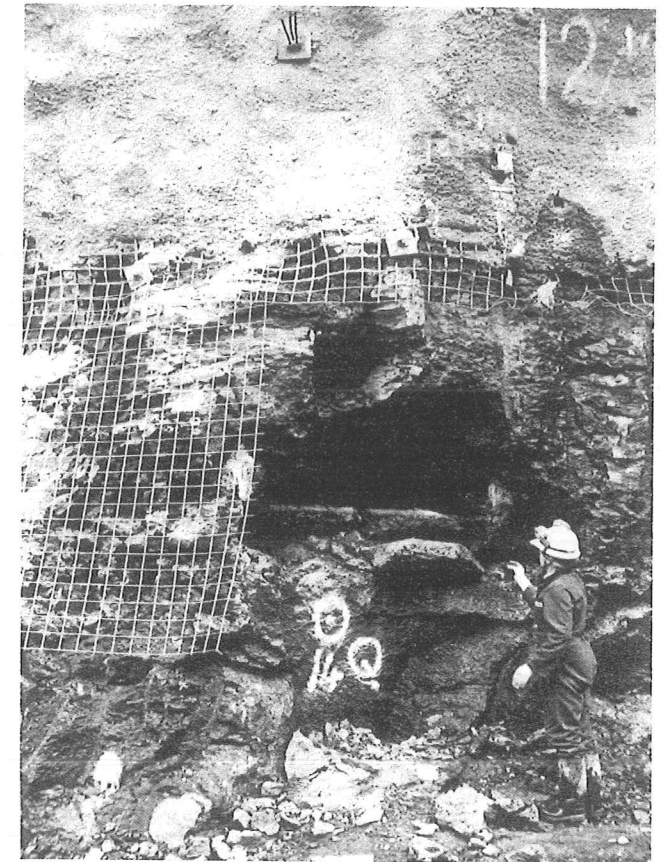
Lava tunnel in basalt, Hoppers Crossing, Victoria, Australia.
